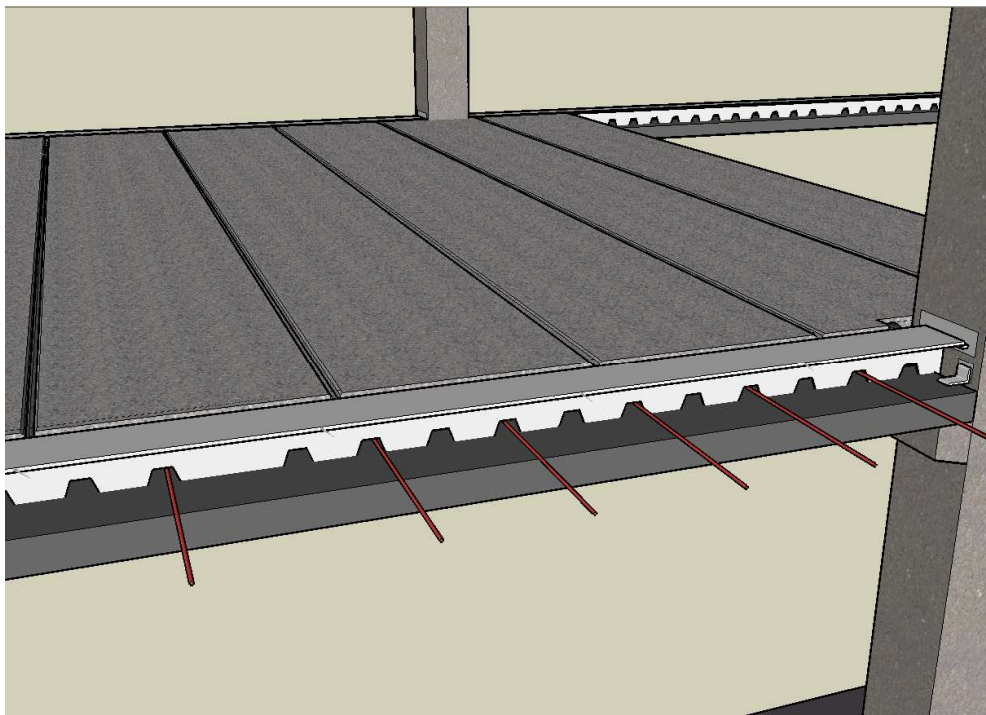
Place hollow-core on one half of beam & feed rebar into hollow-core
